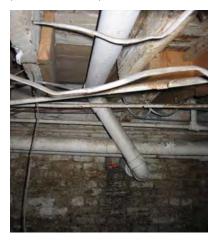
PVC piping at ceiling. (Photo: BBB, 2007)
